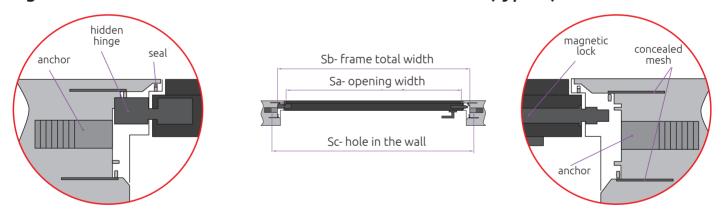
SECTION OF DOOR FRAME OPENING OUTWARDS (type B)
